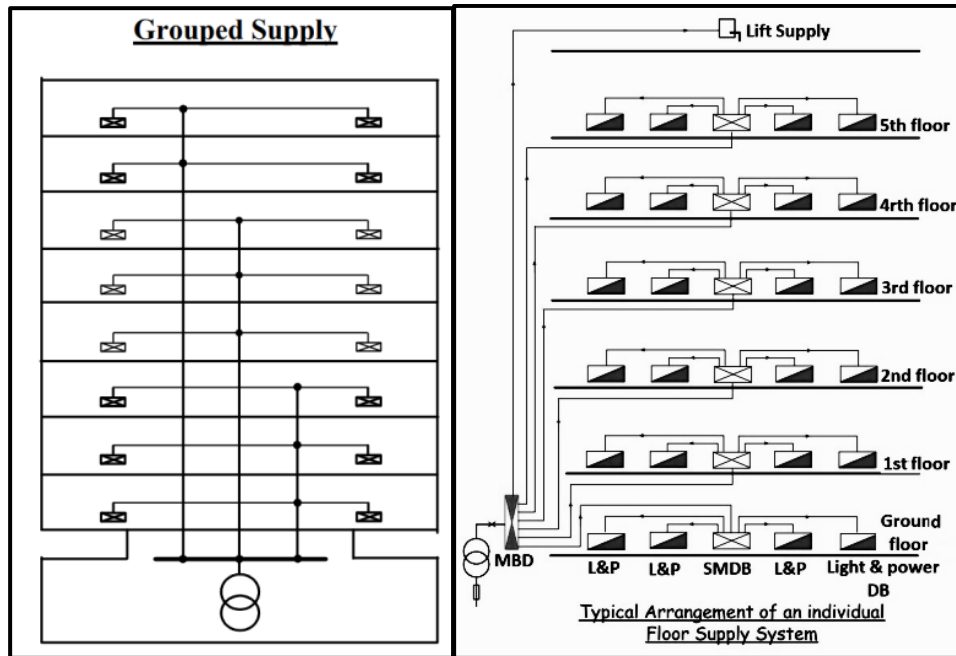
“Individual Floor Supply” arrangement in a multi-storey building
